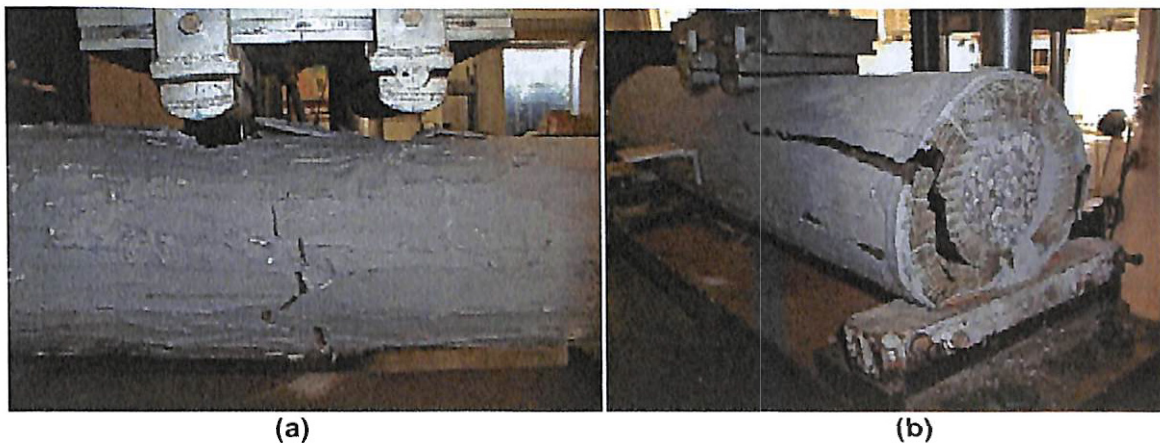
Failures of Timber Piles with Repaired Core: (a) Flexural Failure on Specimen C4; (b) Shear Failure on Specimen D4
